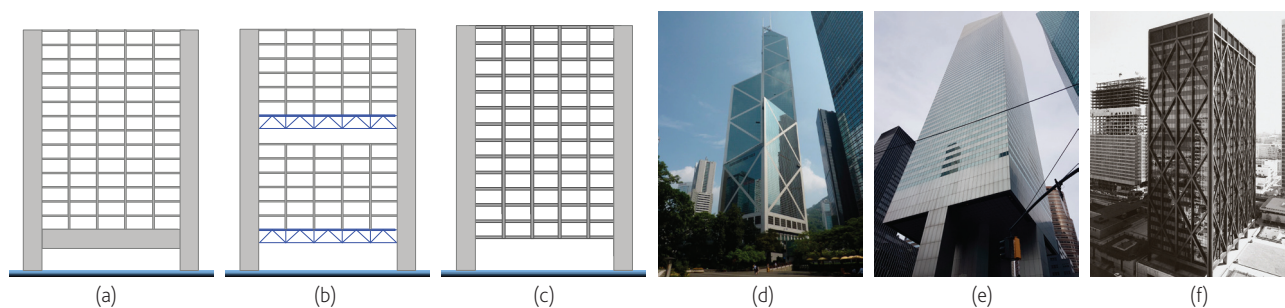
(a) Single-storey TS; (b) Multi-tier TS; (c) Structural frame transfer system; (d) Bank of China Tower, Hong Kong, China; (e) Citigroup Centre, Manhattan, New York, USA; (f) Alcoa Building, San Francisco, USA
